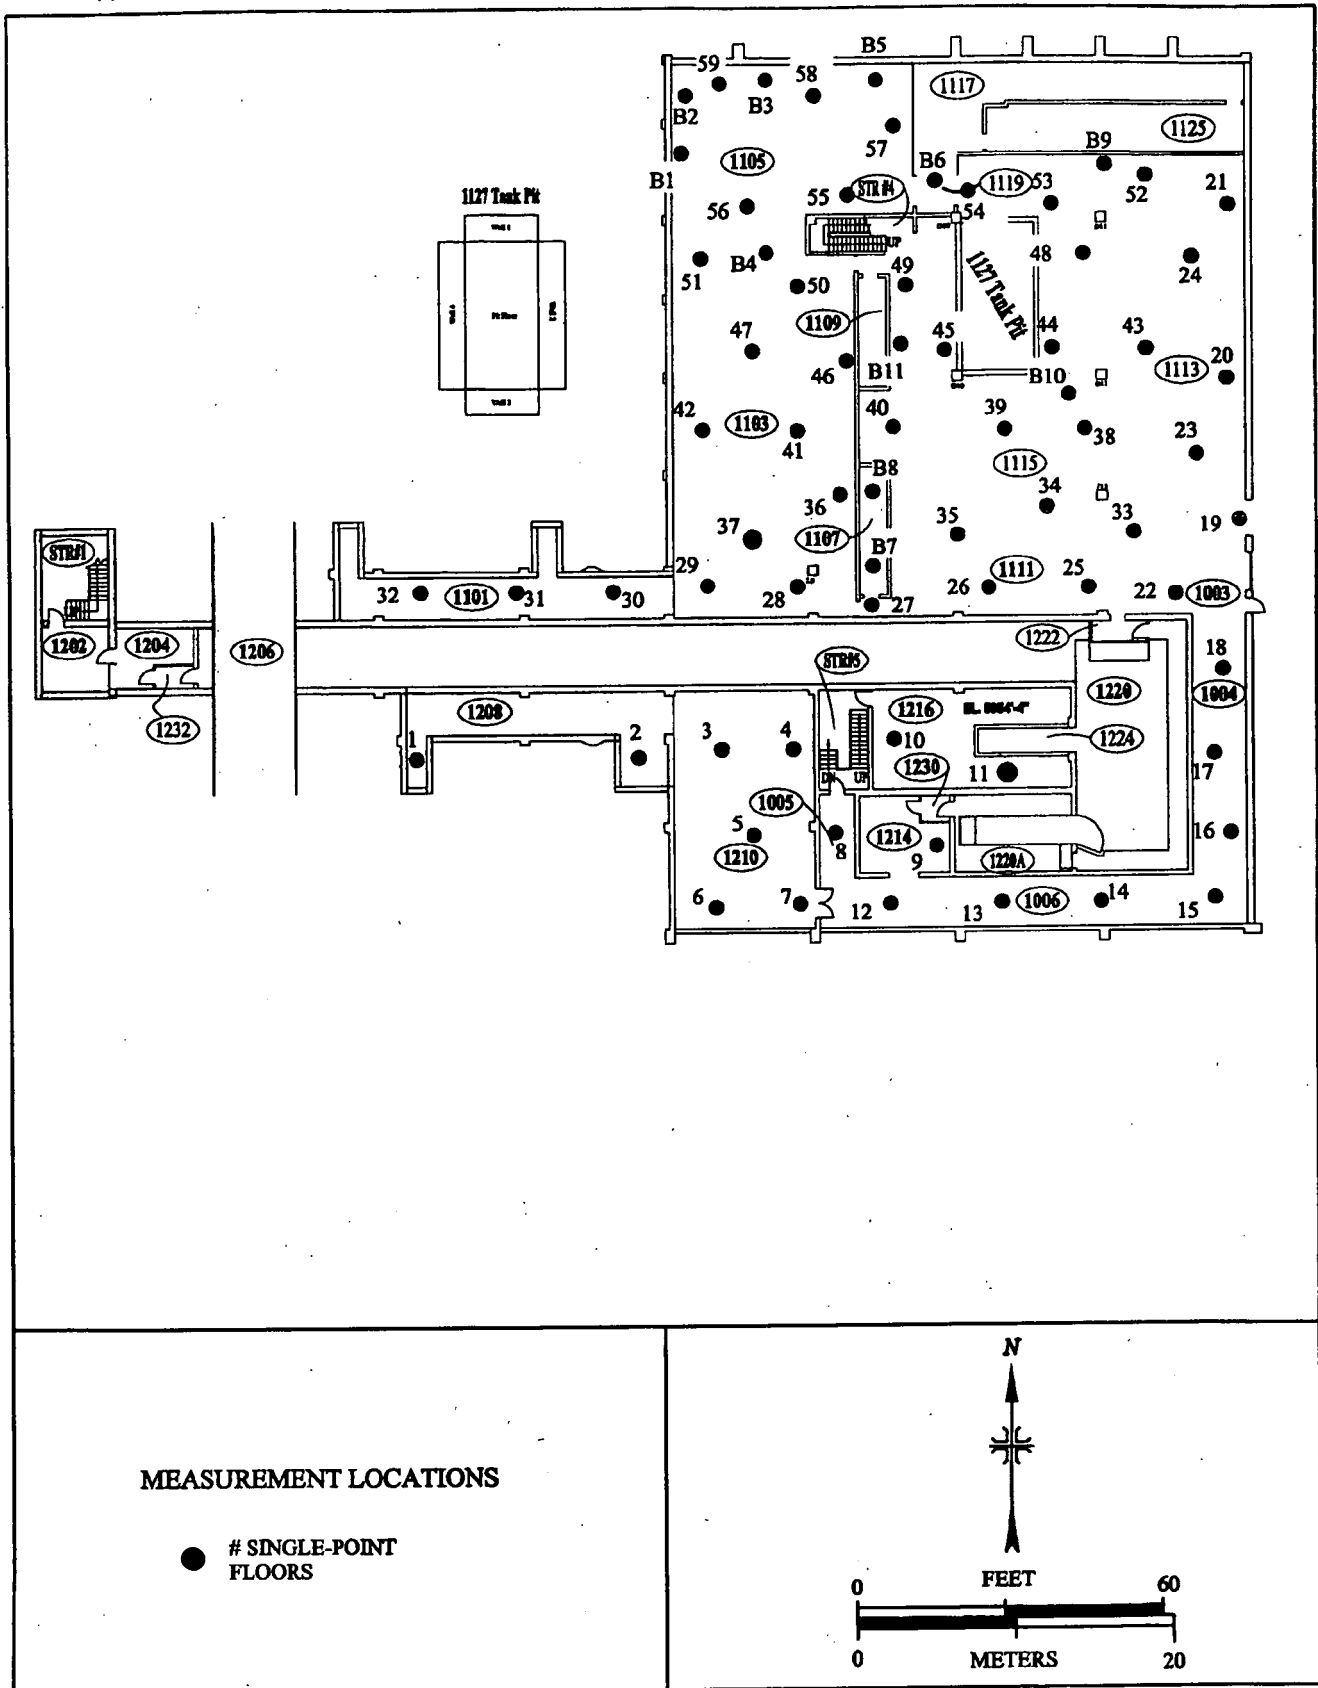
Building 371, Survey Area G - Measurement Locations
